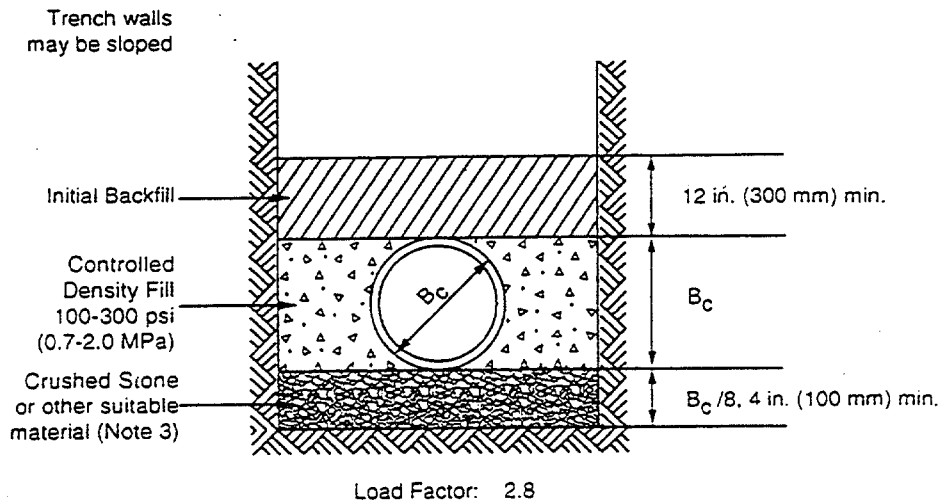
Bedding Detail for Clay Pipe with CLSM Backfill (ASTM C 12)
